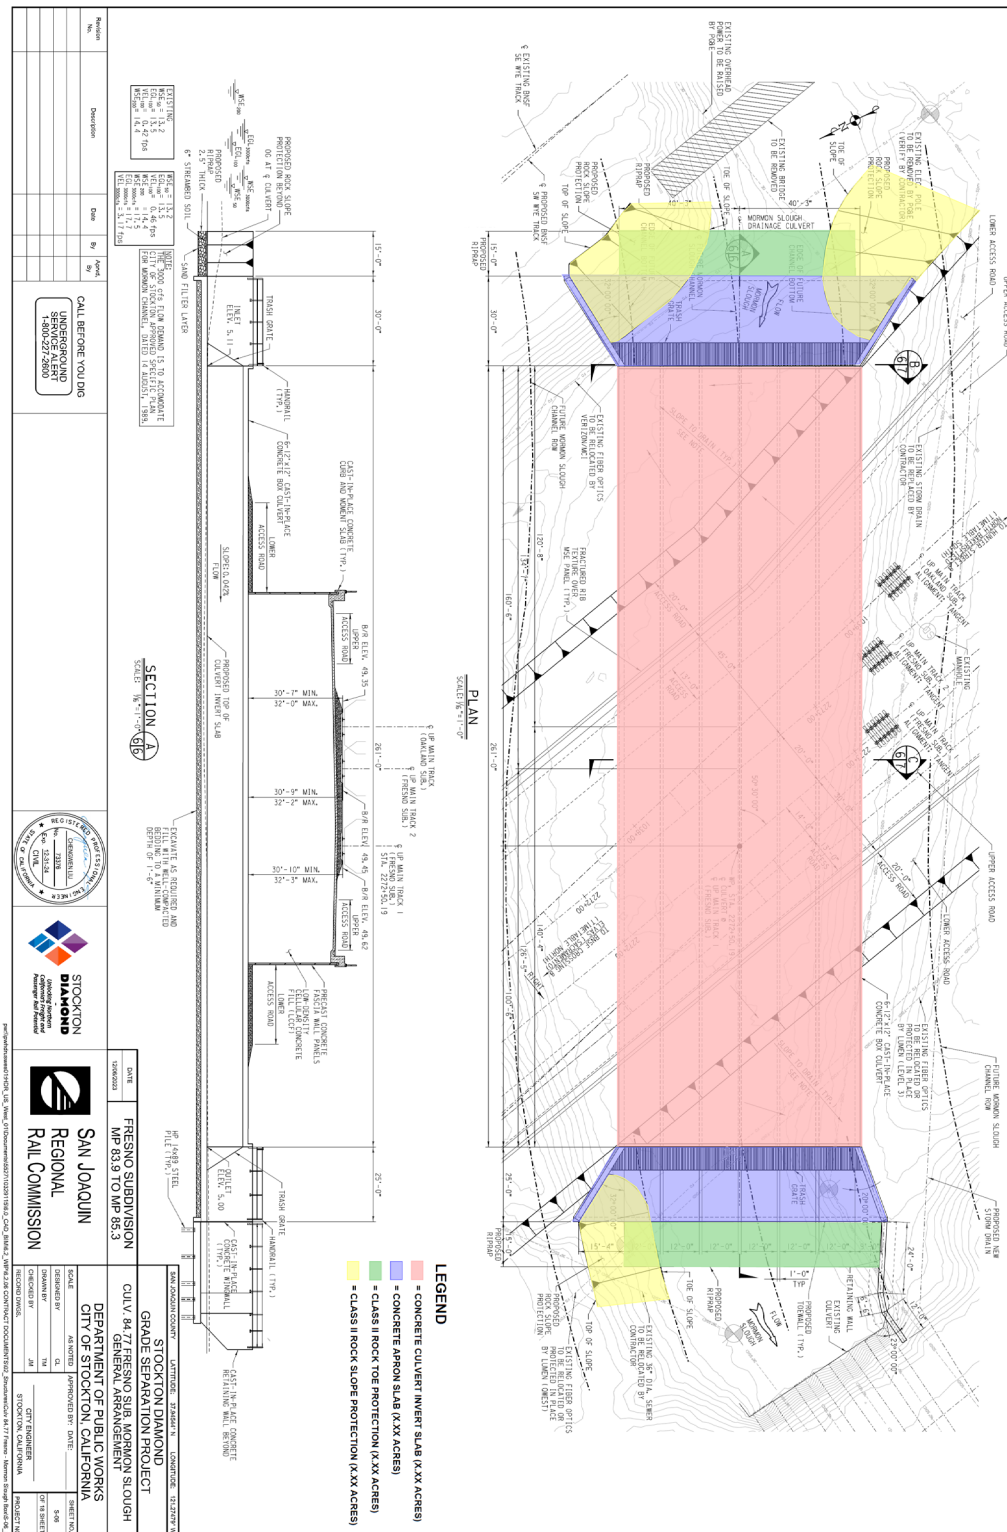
General arrangement of the culvert in the Mormon Slough. Trash grates will be installed across the entirety of the culvert on both ends with grates spaced 6 inches on-center. Rock slope protection (RSP) will be placed on slopes of the streambed adjacent to the culvert, and riprap armor will be required at the base of the culvert footing to prevent scour (HDR 2024).
